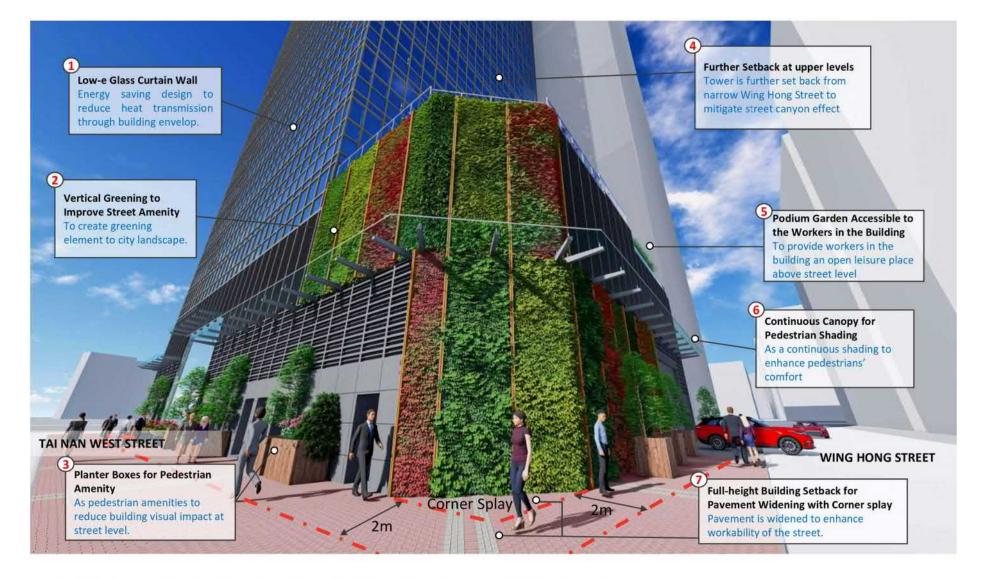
Proposed Non-building Areas Widen Existing Footpaths
